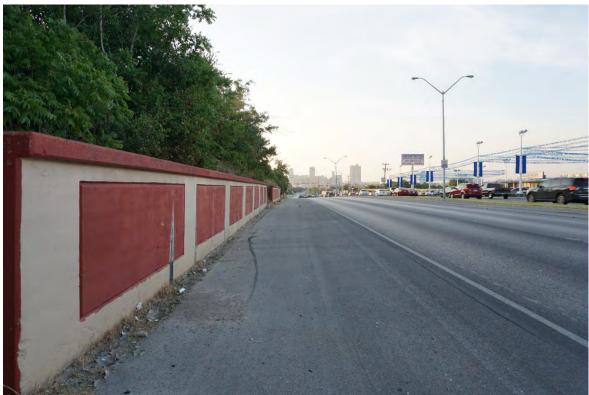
Photograph of SH 199 Looking East Along Concrete Retaining Wall
